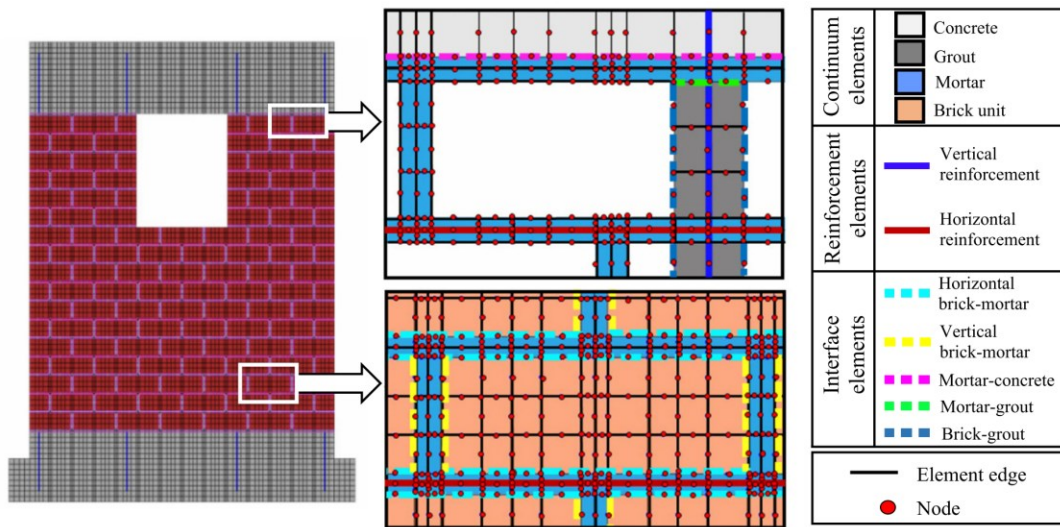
Modelling Approach for PG Masonry Walls (Calderón et al. 2017)
